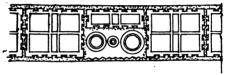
Plan View of Pipe Chase for Plumbing and Steam Pipes
